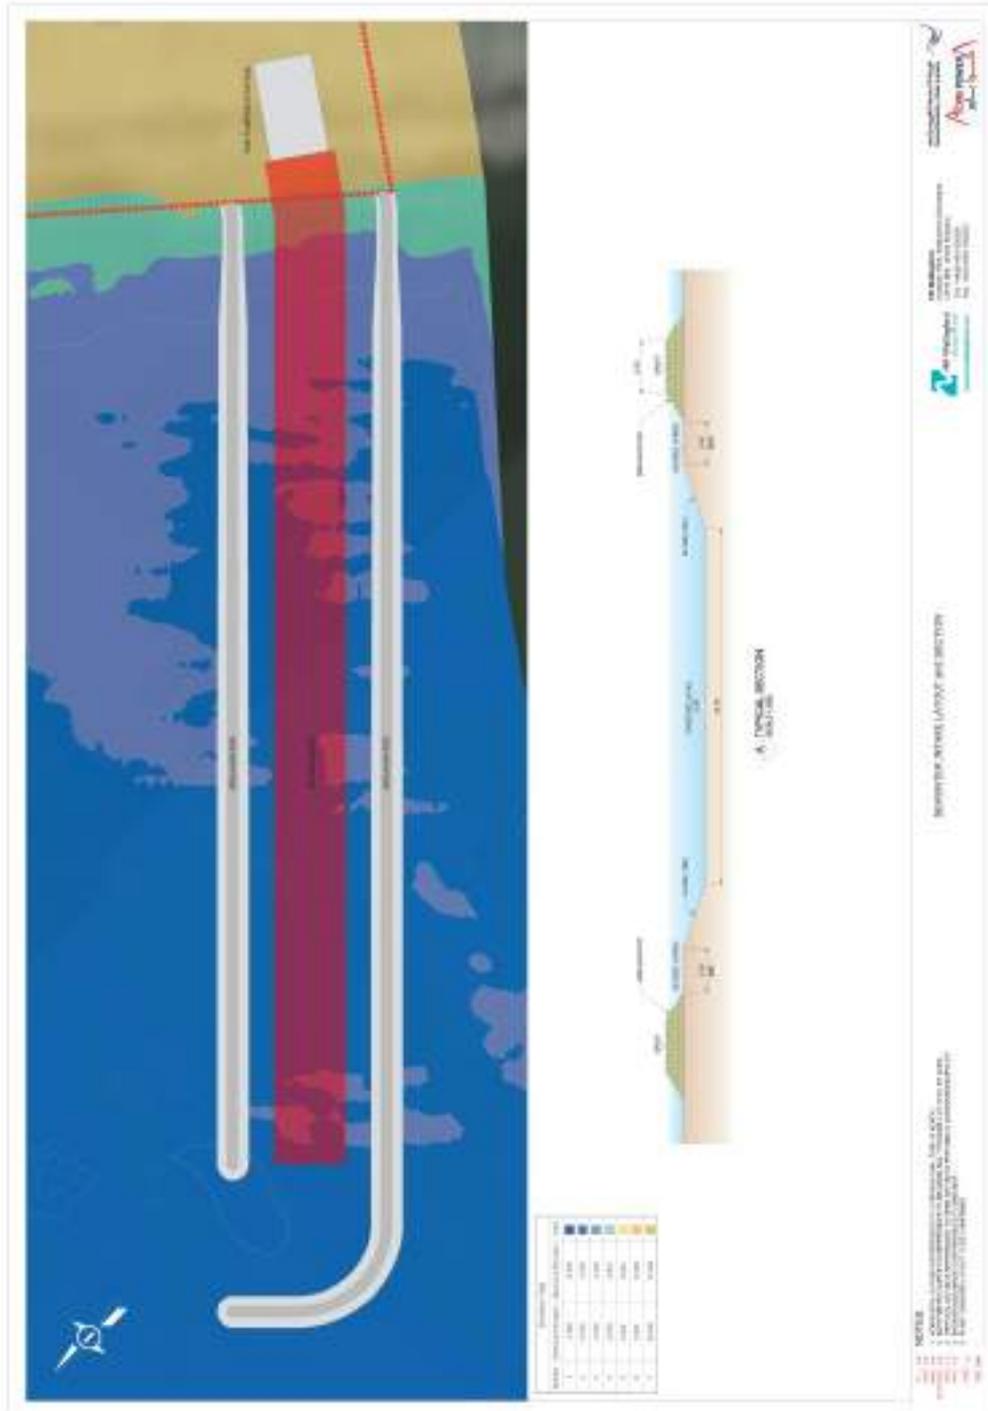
Concept open intake layout with breakwaters, seawater intake layout and section
